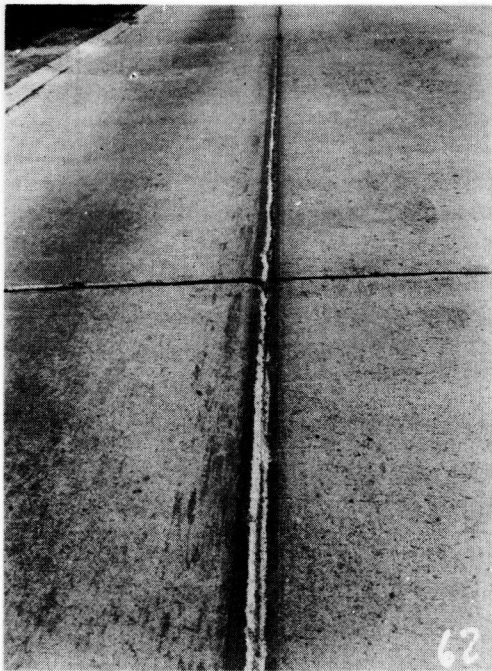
Typical joint after cutting with concrete-grooving-and-joint-cleaning machine.
